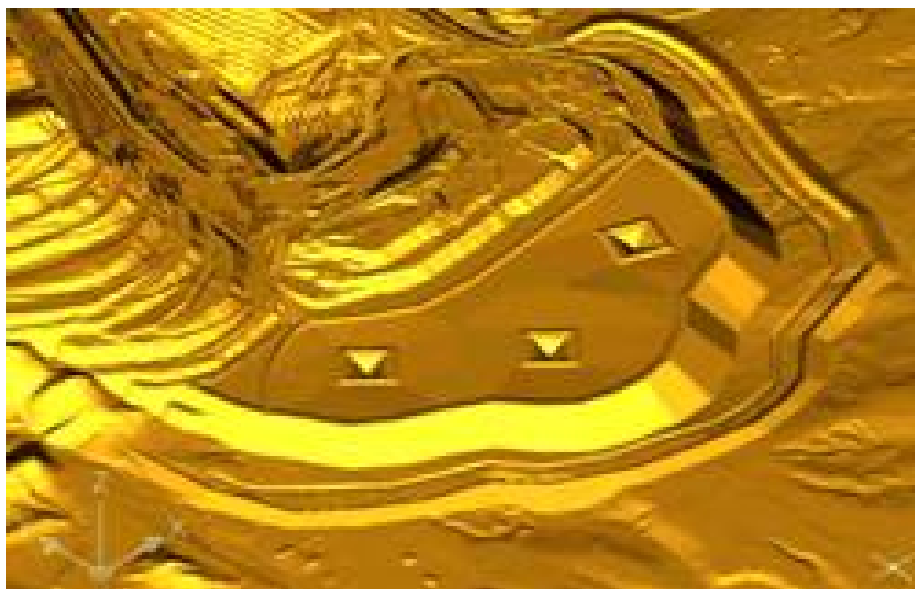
Modified layout of sumps in sub-surface drainage concept
